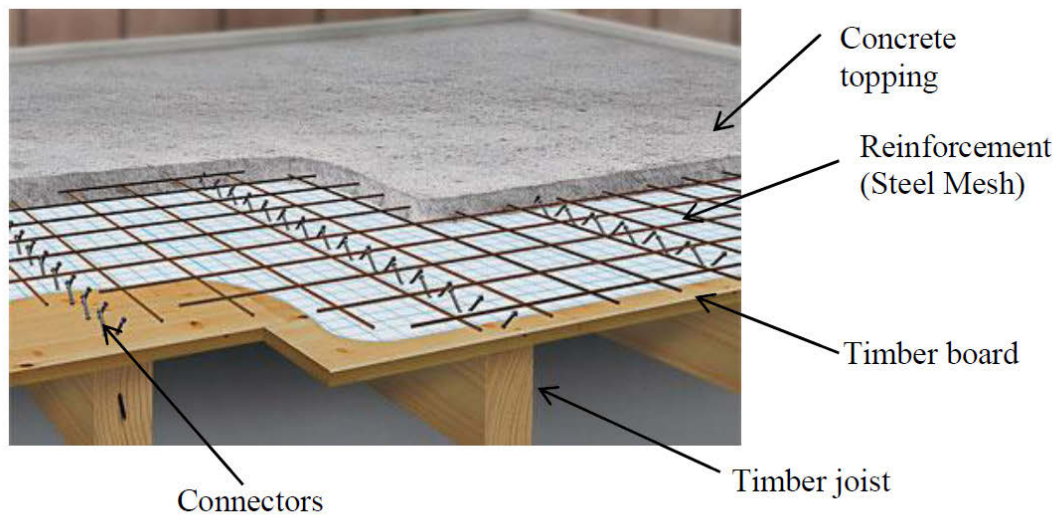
Timber-concrete composite floor (adopted from SFS-Holz Beton-Verbundsystem)
